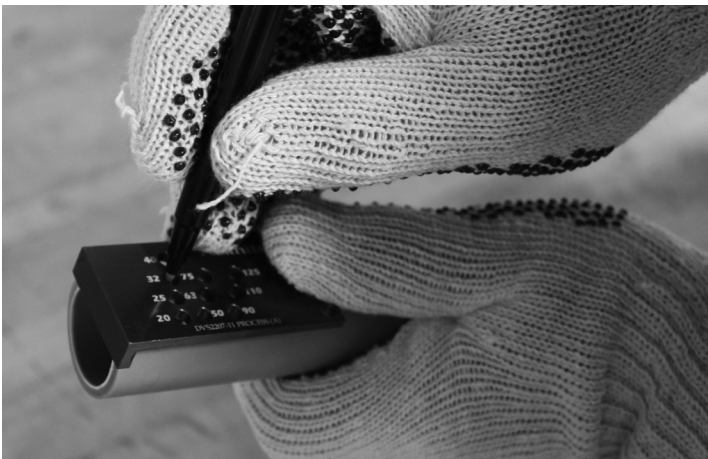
Mark the weld insertion depth on the pipe.
